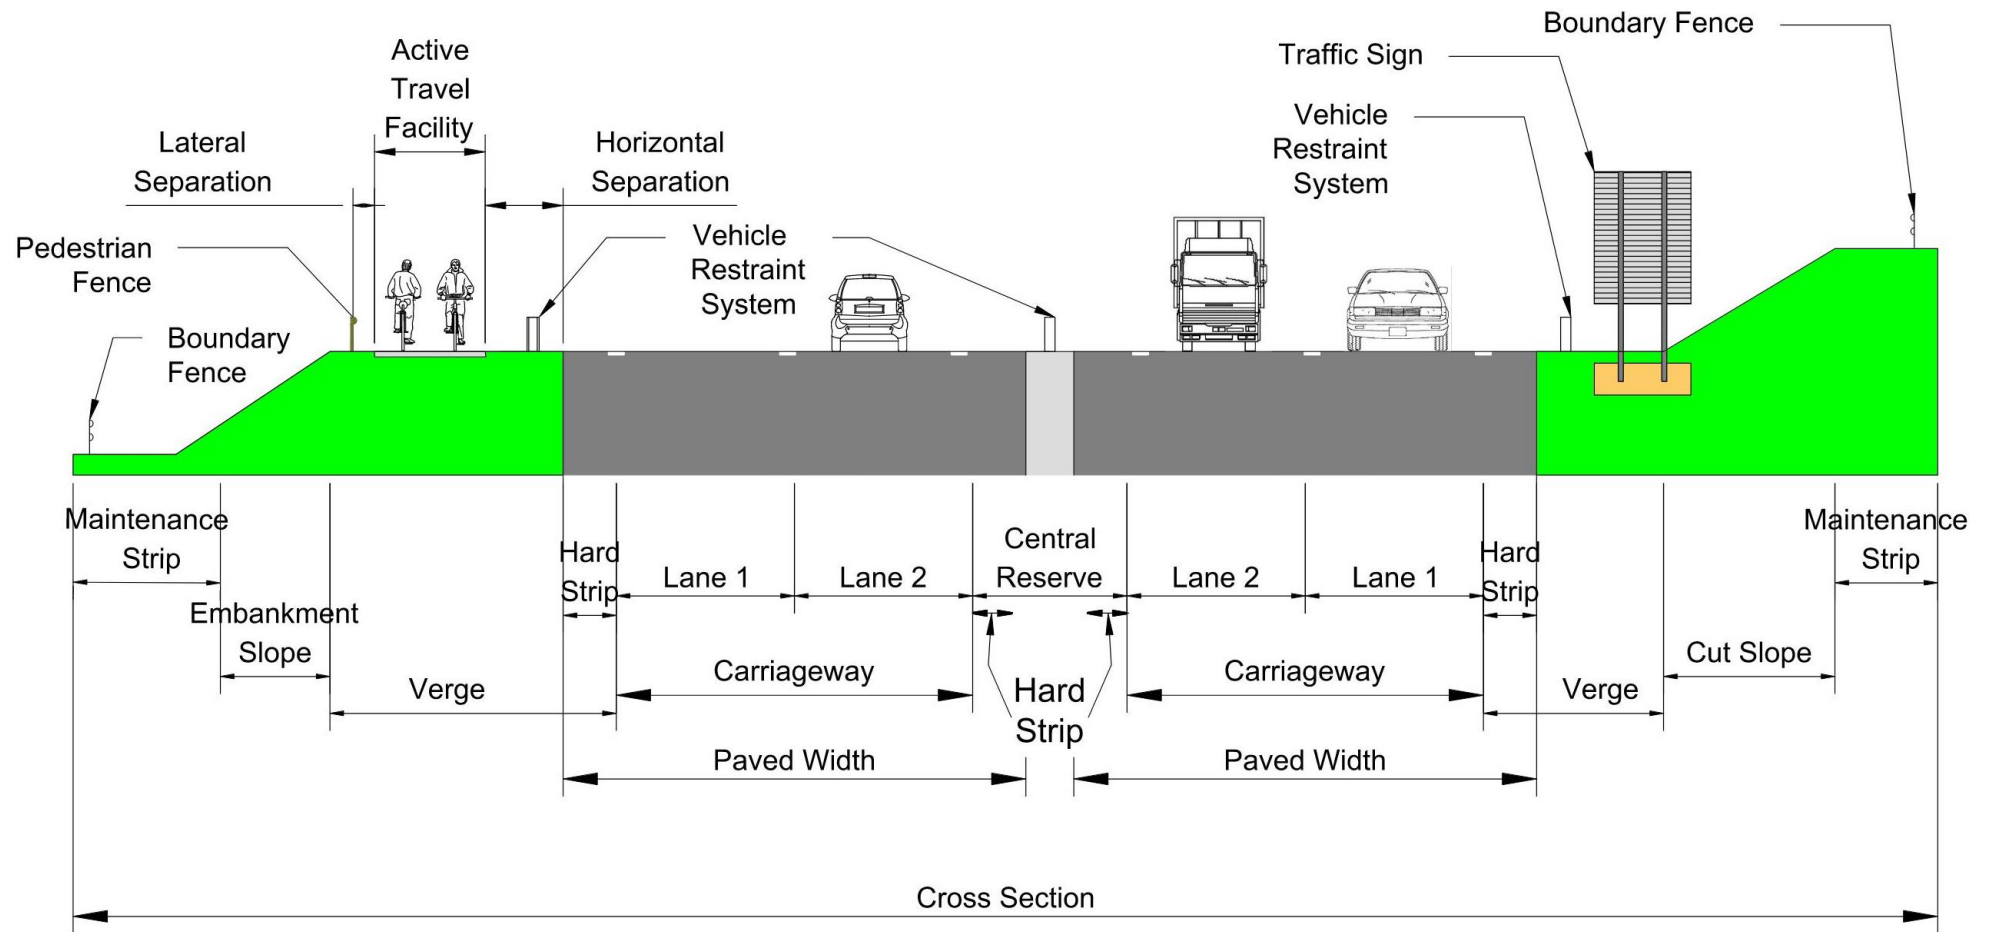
Typical Type 2 Divided Road Cross Section Components
